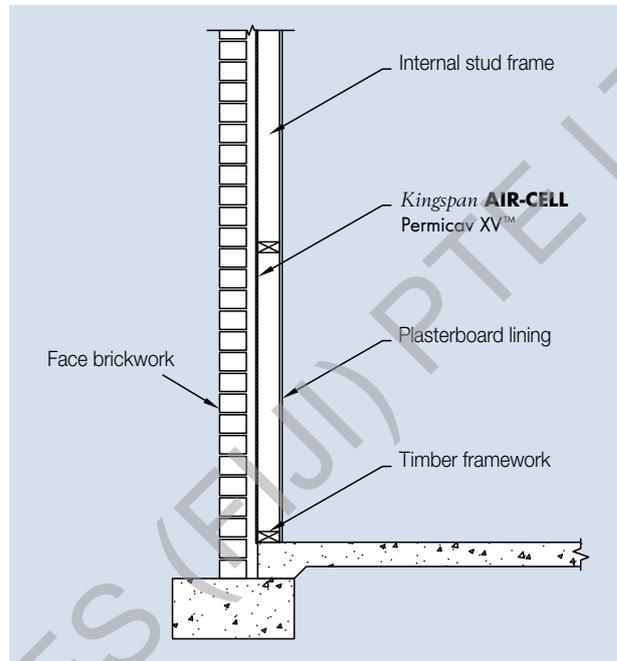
Side elevation of Kingspan AIR-CELL Permicanv XV™ in brick veneer wall
